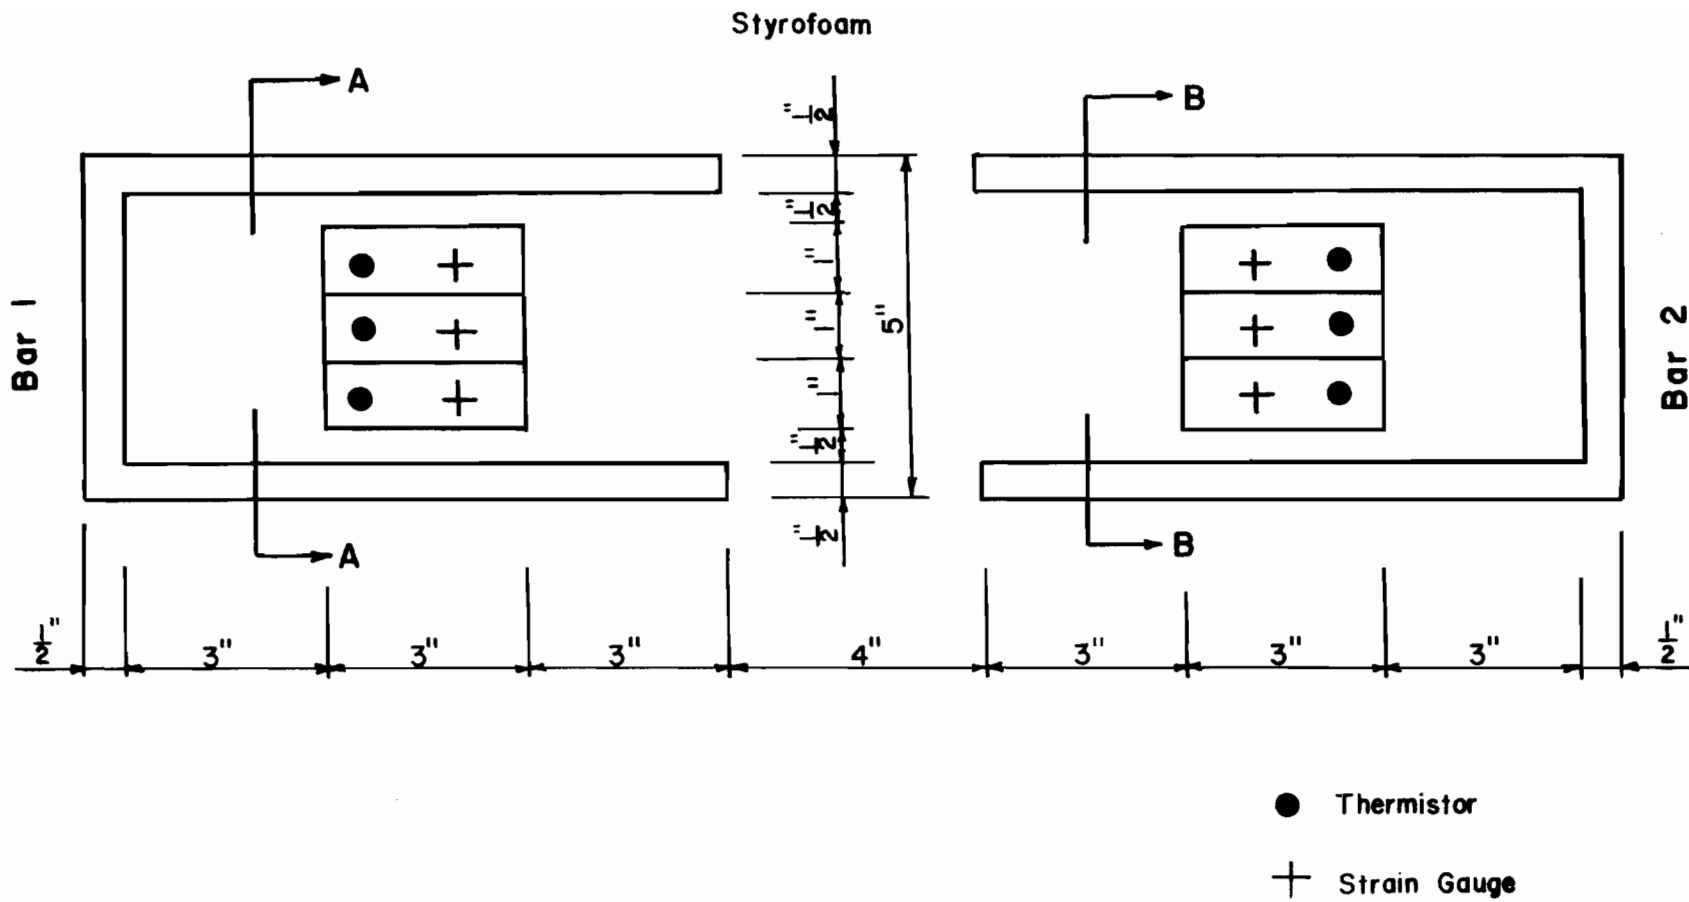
Plan View of Reference Bar Instrumentation at Location 5
